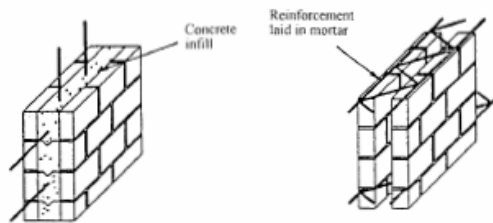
Use of truss type reinforcement in multi-layered walls (after [12]).
